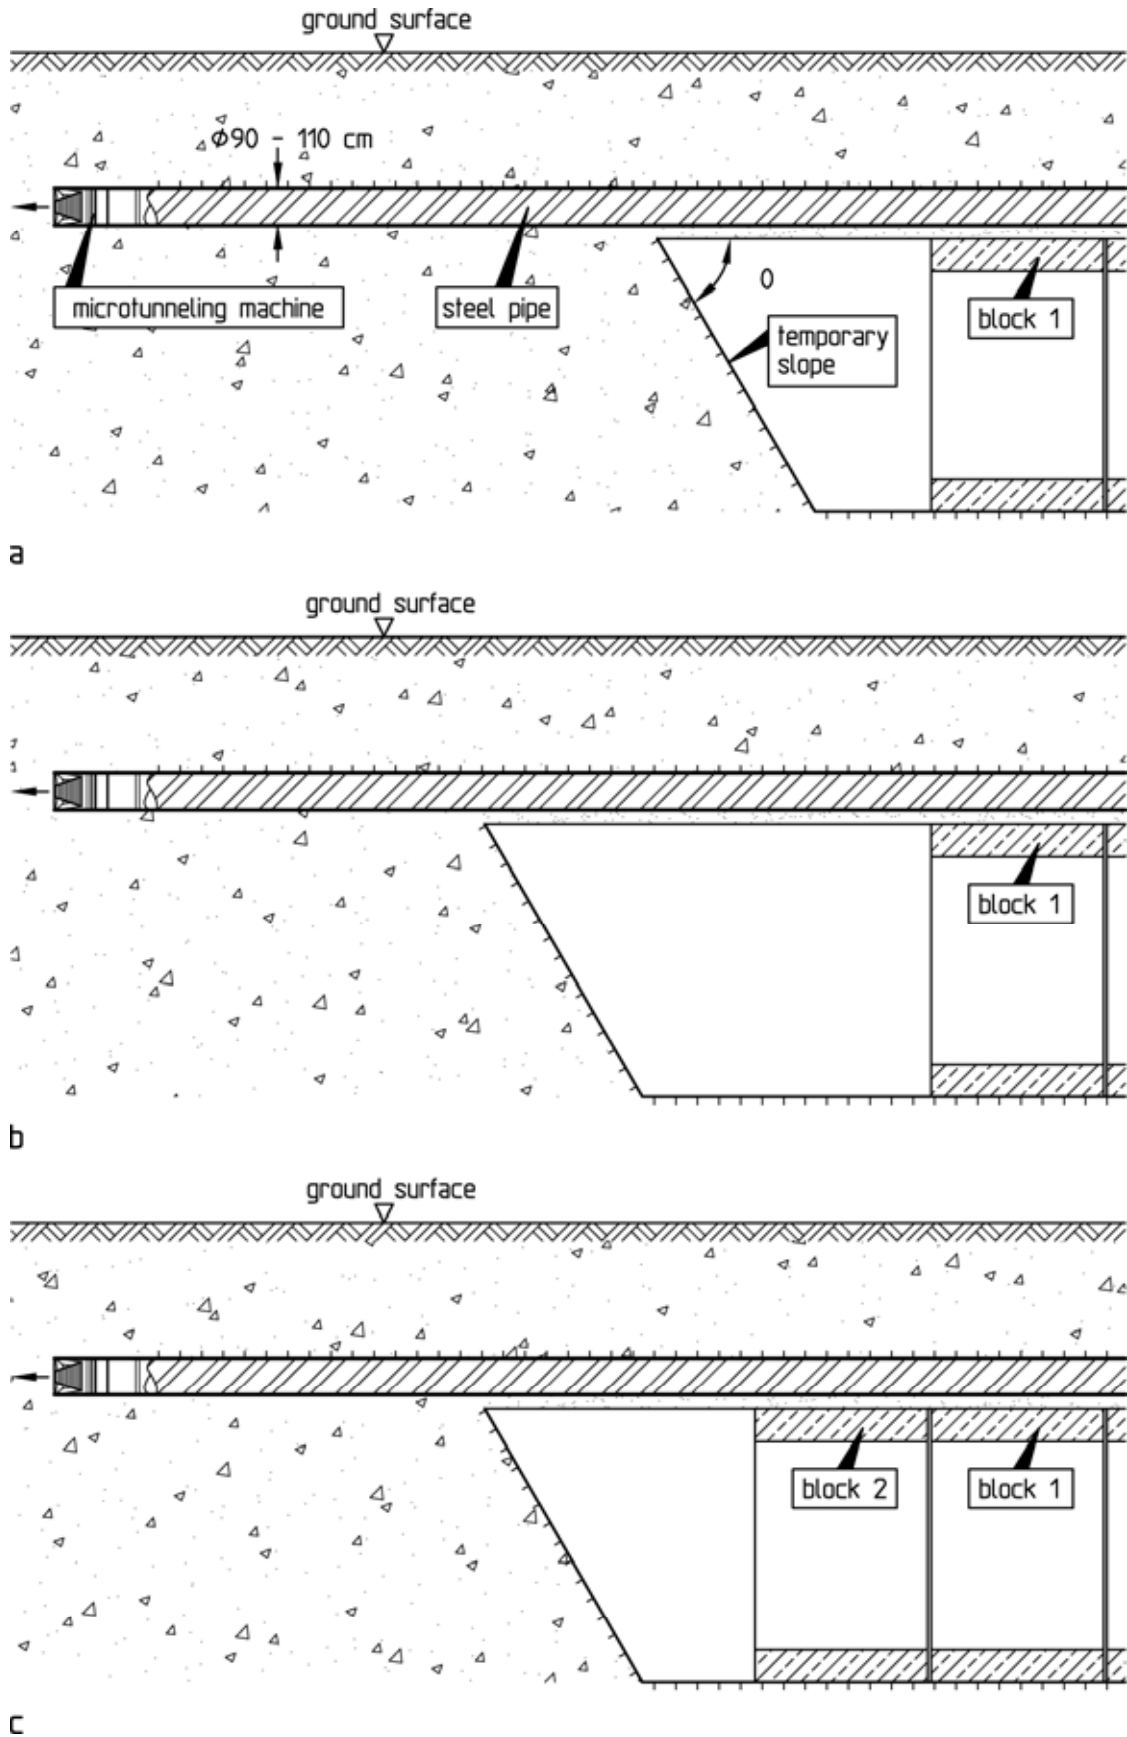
Elite Tunnel, tender design, construction stages: a) Installation of block 1; b) excavation; c) installation of block 2
